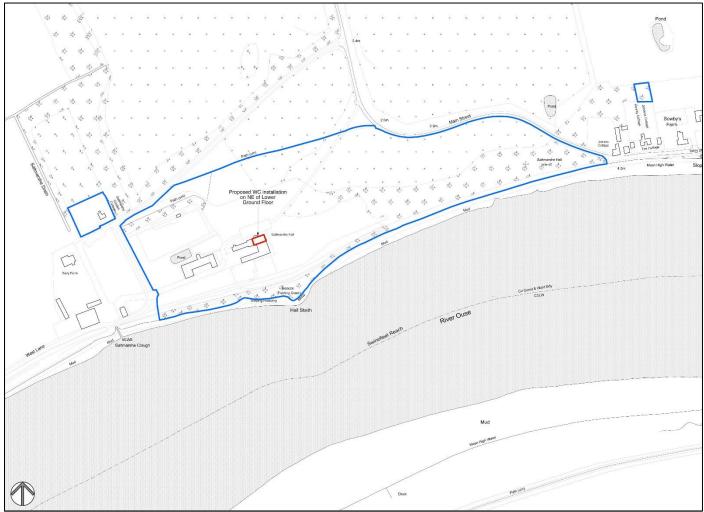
Plan of ownership showing Saltmarshe Hall in its parkland context (blue line) and application site (red line) as prepared by Powell Tuck Associates
